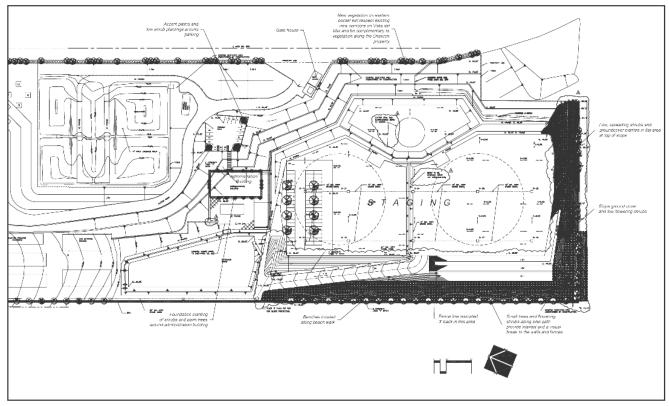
Landscape Concept Plan from the September 2002 Final Staff Assessment
